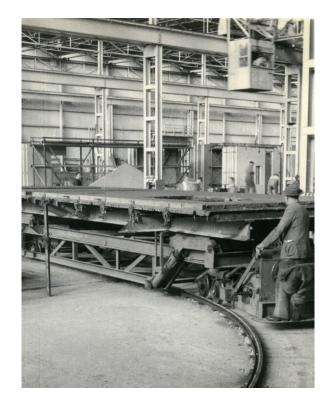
A concrete wall panel on the Holmesglen factory floor (Source: Stanford, N.W Concrete House Production)
